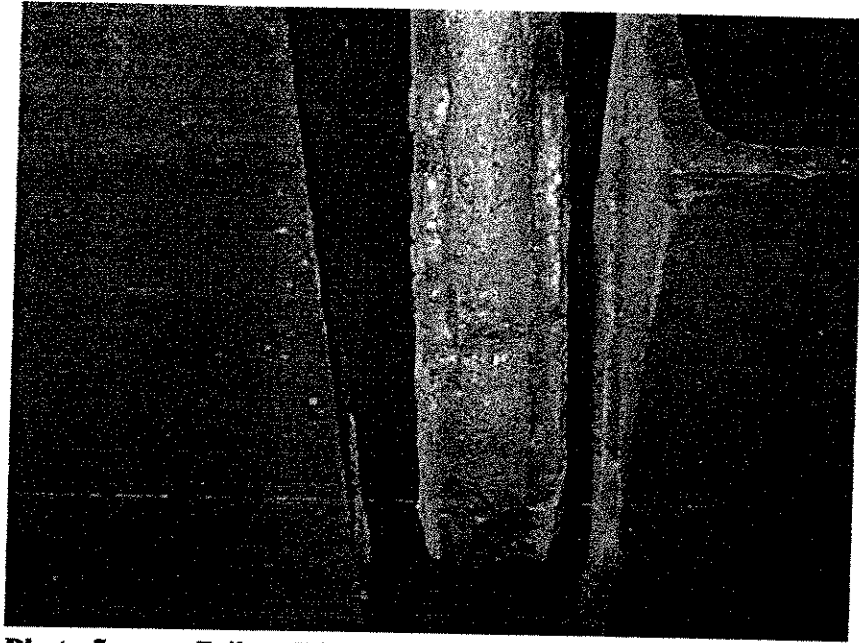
Failure Discovered at Panel Point 2 on Joist 1
